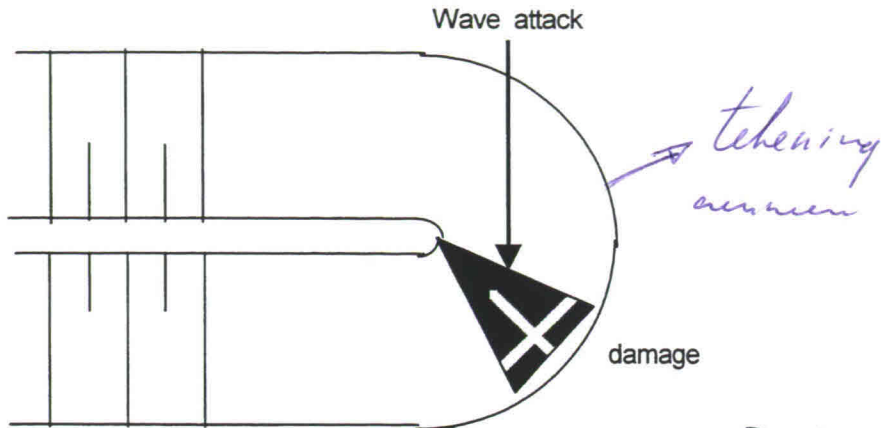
, Typical Damage Pattern Breakwaterhead 7-9
